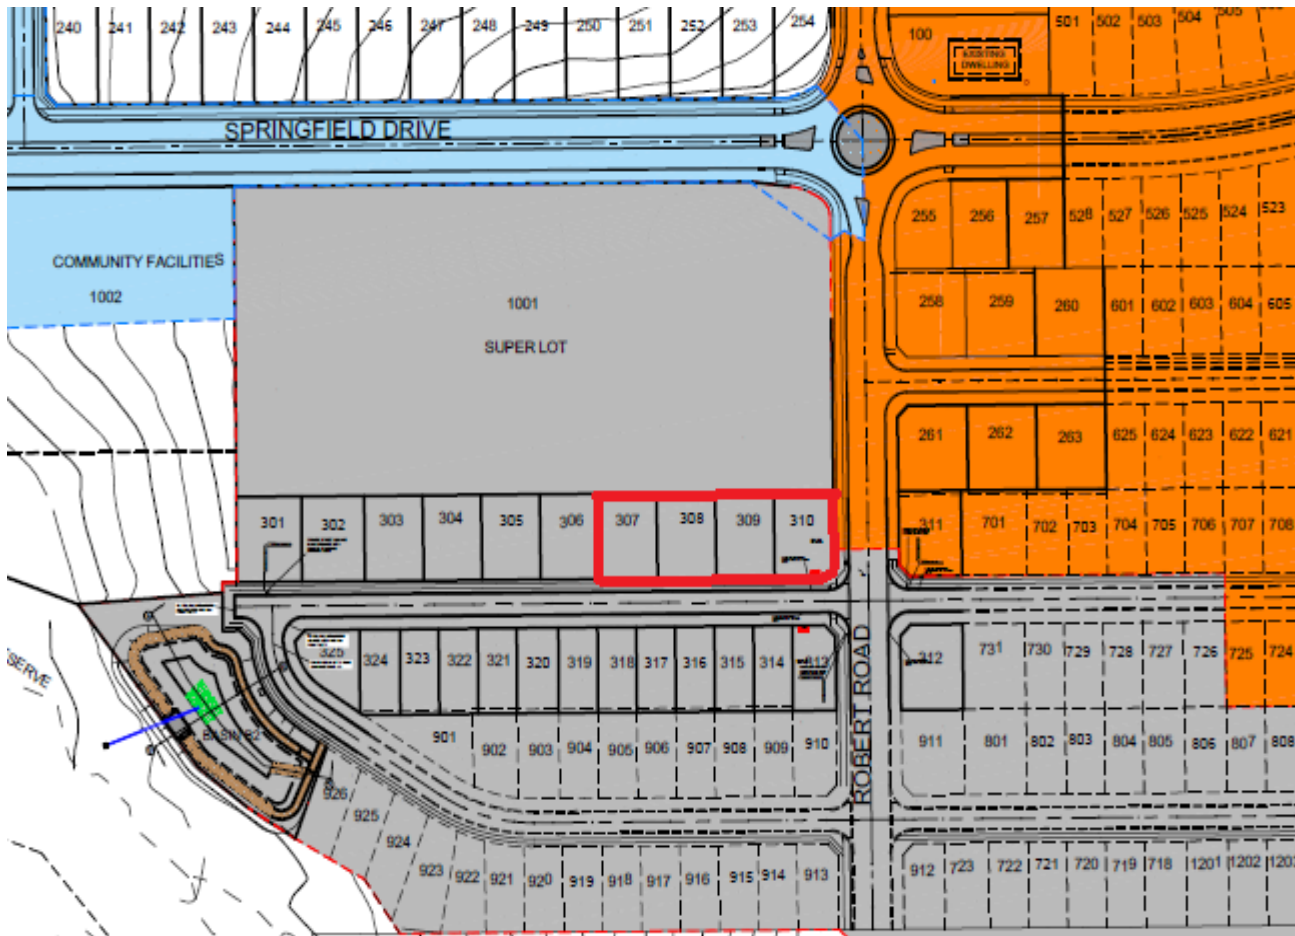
Childcare Centre location on Approved subdivision plan, approved under DA18-456
